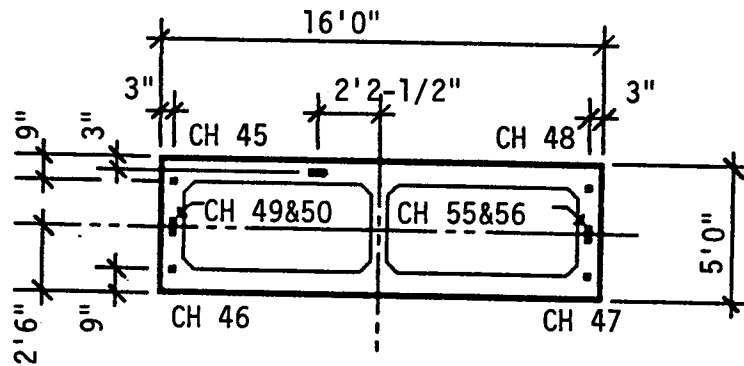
Concrete Strain Gage Layout-Section A-A
